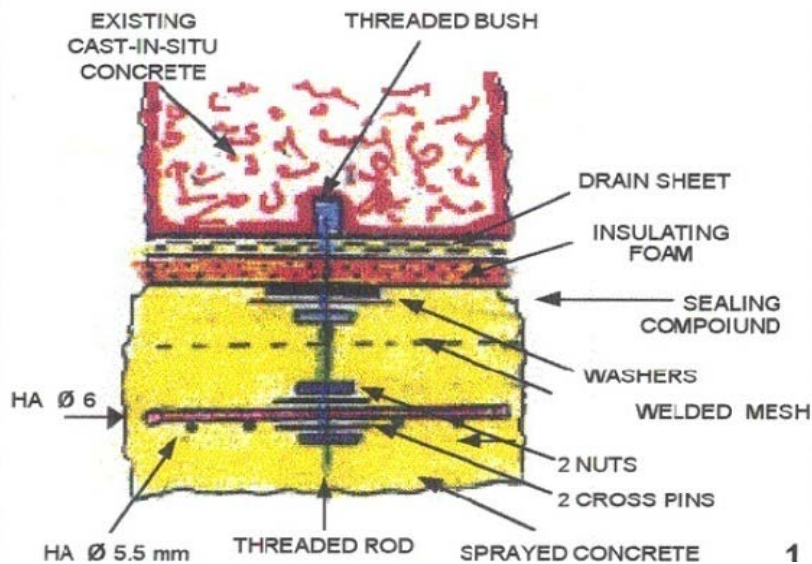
Sealing of leakage water using a drain sheet, insulating foam, and reinforced welded-mesh sprayed concrete. This system is anchored to existing concrete via a threaded rod and nuts/washers (Russell, 2001).
